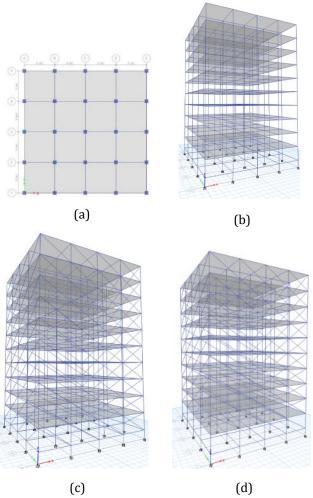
a) Plan View b) Bare Frame c) Fully Infilled d) Soft Storey Model of 10 storey building
